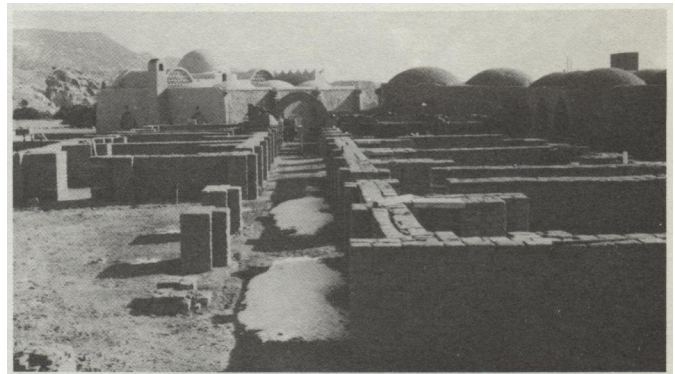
Lower walls and the first series of domed classrooms for the madressa under construction with the completed mosque in the background.
